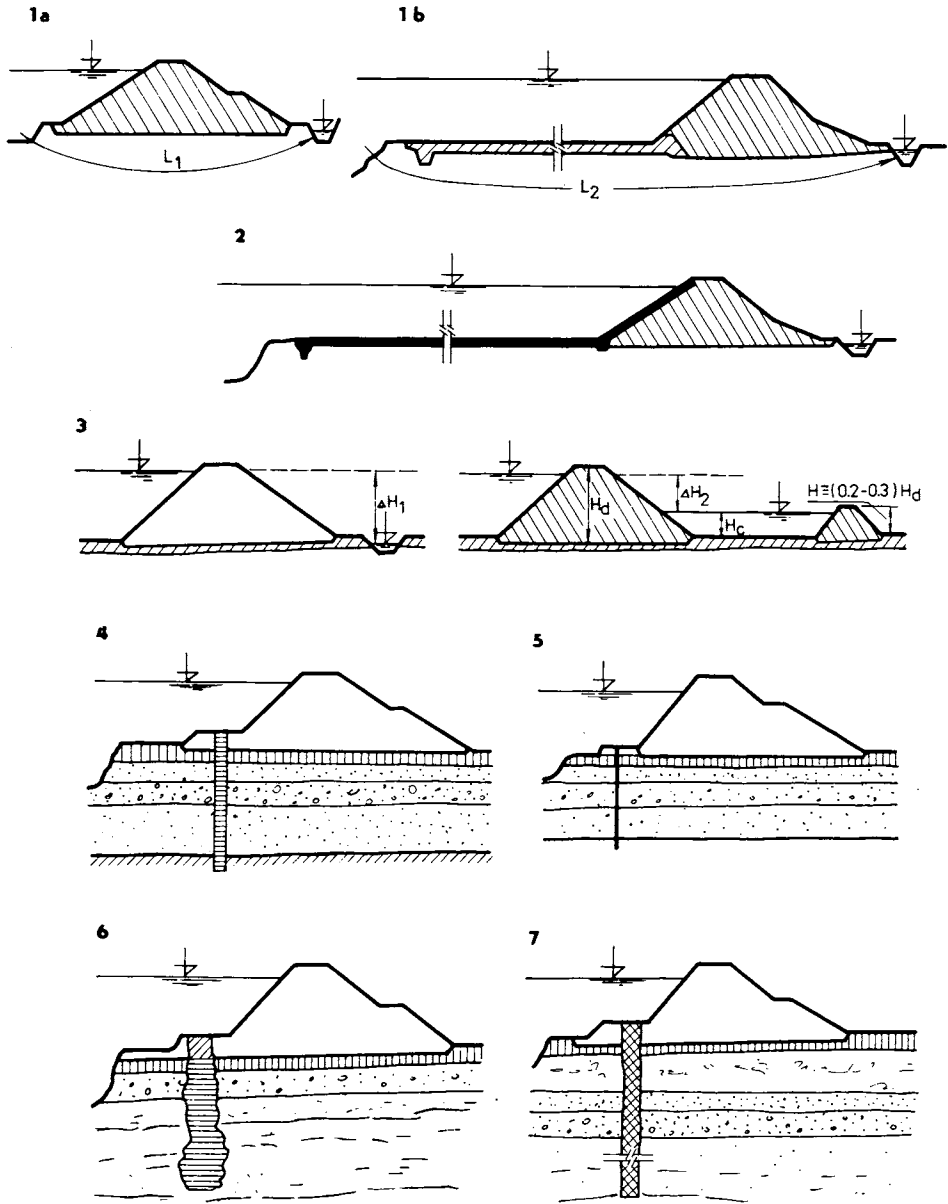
Elements of passive protection. 1b—earth (natural) blanket, 2— asphalt-concrete (from artificial materials) blanket, 3 — pressure casket, 4 — slurry trench wall made of concrete and laid in a trench, 5 — diaphragm wall, 6 — grout curtain, 7 — curtain formed by depth vibration.
